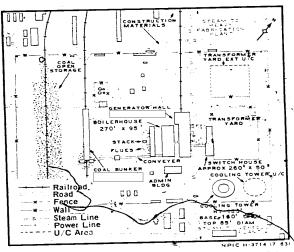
LAYOUT OF THERMAL POWER PLANT NO 2.
